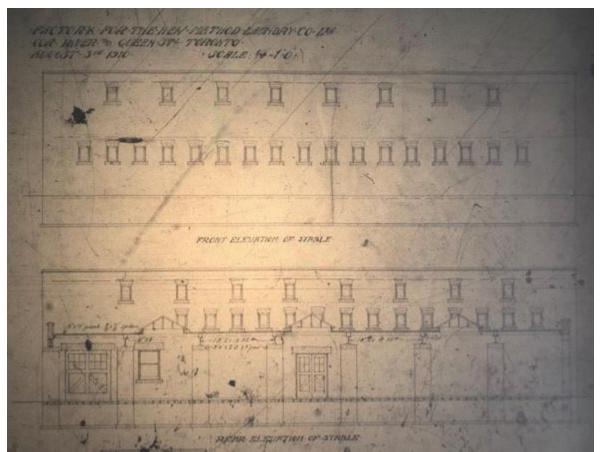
Architectural drawing (1910) of the front and rear elevations of the New Method Laundry building's rear stables (heavily modified by later additions/expansions).
